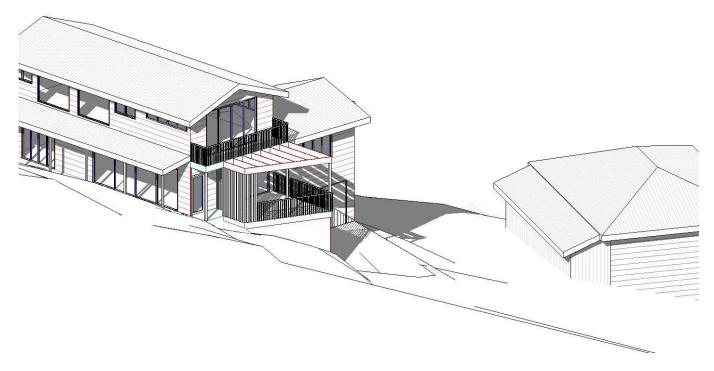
Parametric shadow details, viewing south - 21 June, 11am
